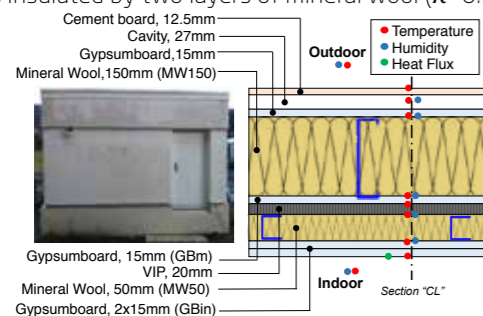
The mock-up building and the measuring locations shown at a section of the wall
